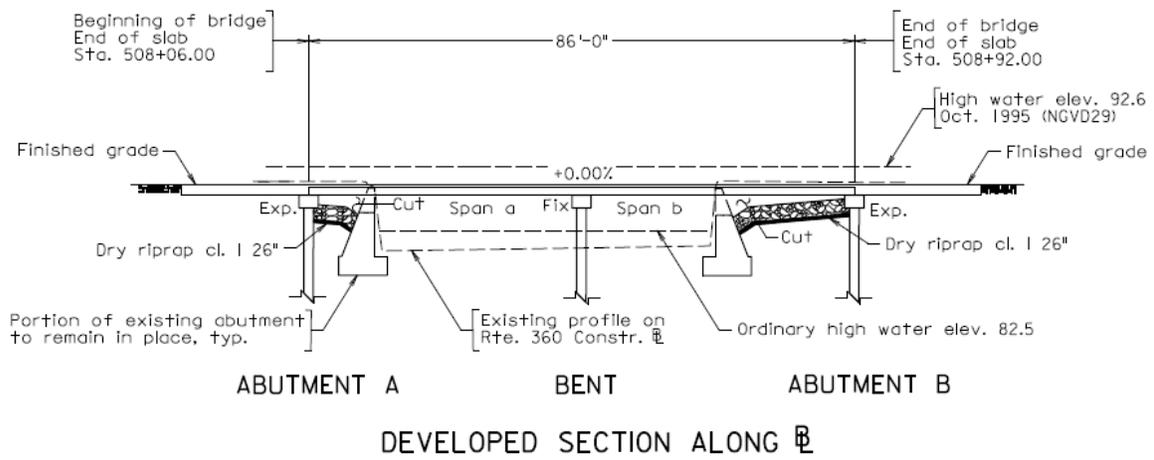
Preliminary elevation of the soon to be replaced two-span continuous bridge on Route 360 over Chickahominy River (Courtesy of Virginia Department of Transportation⁶)
